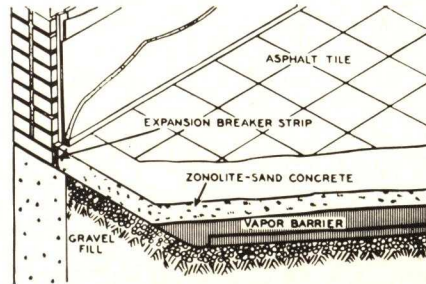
Zonolite-Sand Concrete Floors on ground.
